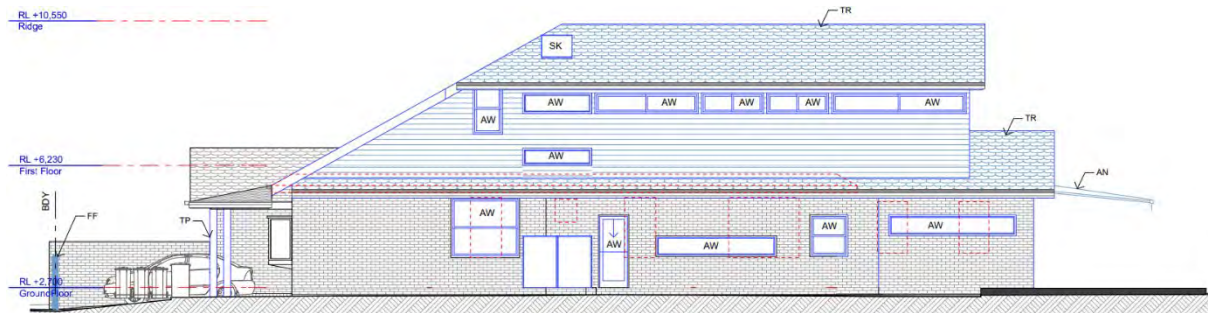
West Elevation 61 Alexander Street, Northern Beaches online DA tool.
